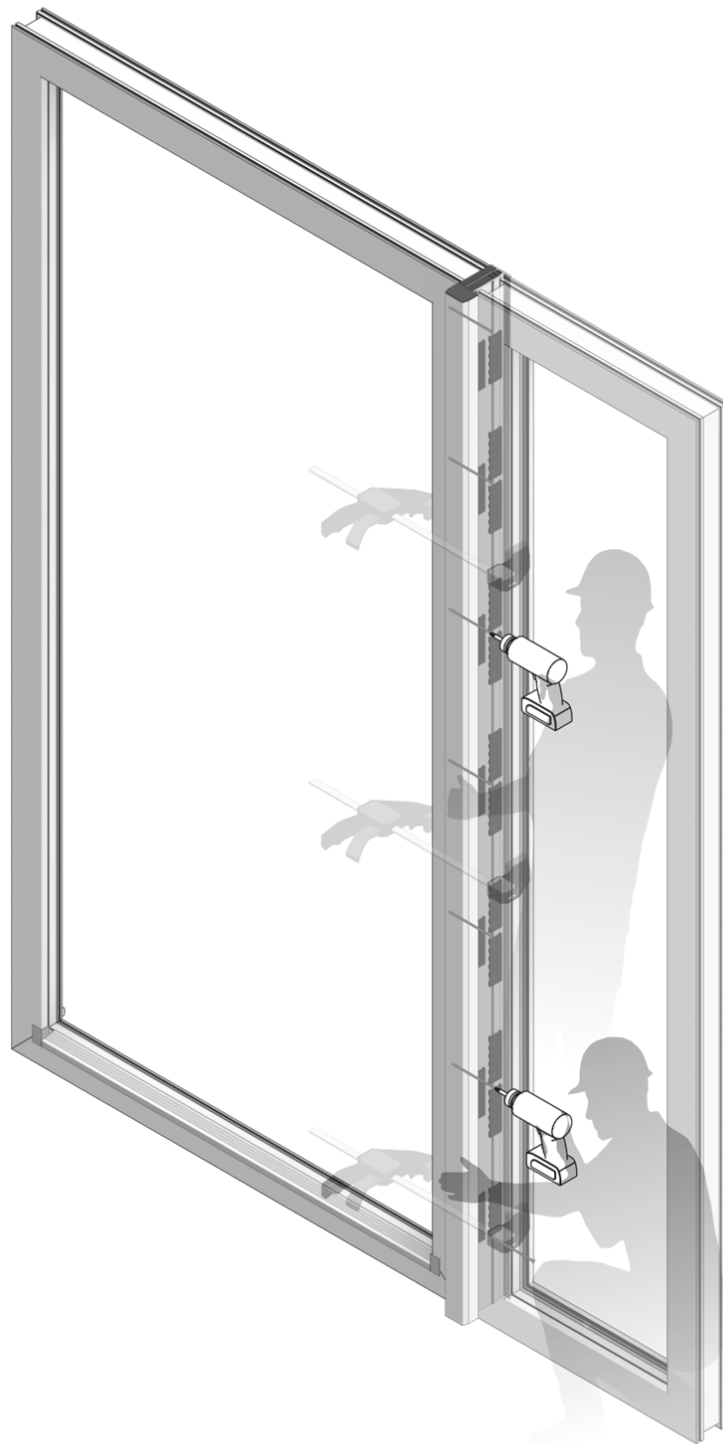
Screwing Frame to Coupler at Pre-Drilled Holes
